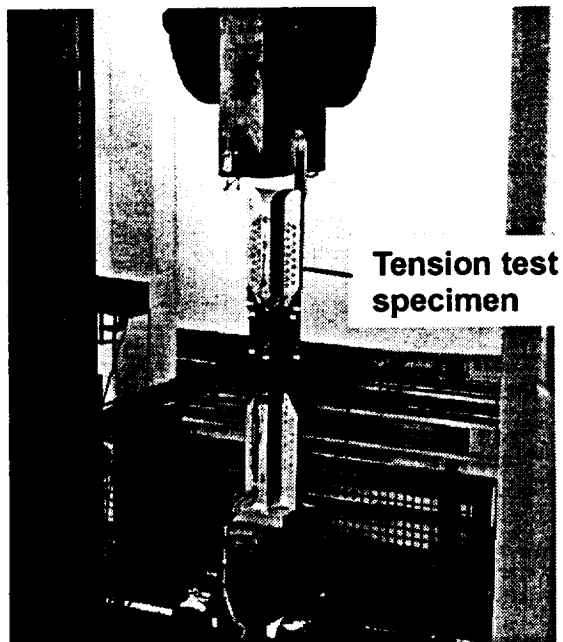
Tension test specimen installed in 1200-kip test machine.
